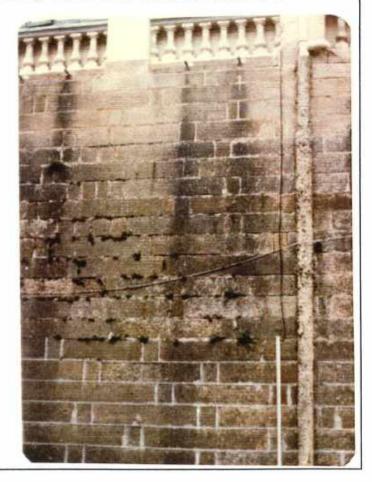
400 Year Old 'Box-bonded' Masonry Wall in HUASHAN, China
